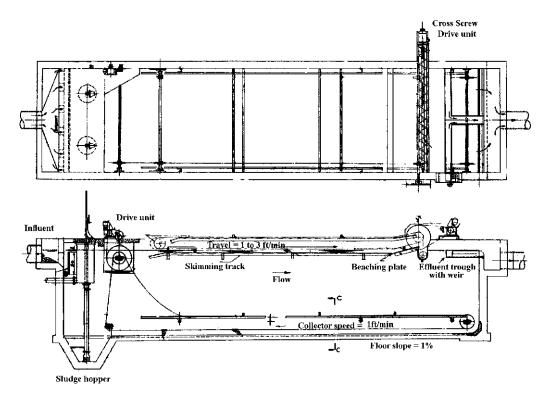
Three-sprocket collector with flight skimmer full length and cross screw conveyor.
